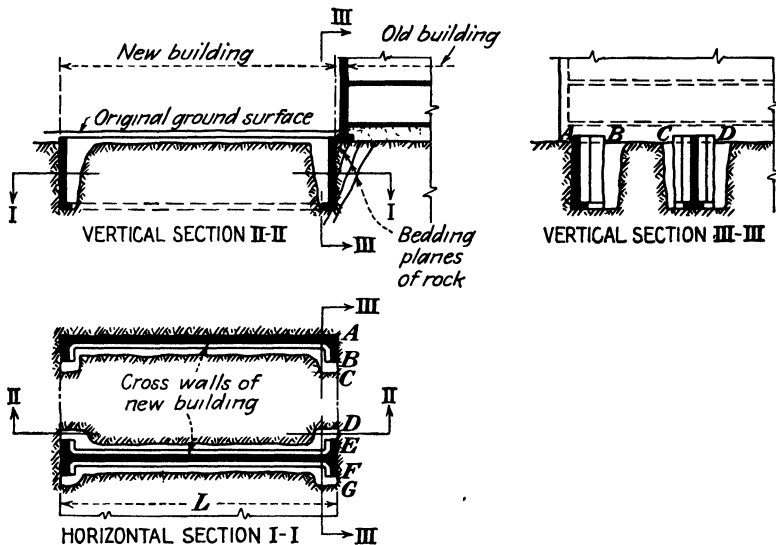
Normal type of excavation for basement of new building damaged adjoining old wall, owing to sliding of underlying rock along inclined bedding planes. Alternating excavation and construction of cross walls in new basement, first step of which is shown in this sketch, solved the problem. (From unpublished data of Spencer, White and Prentis, Inc.)
